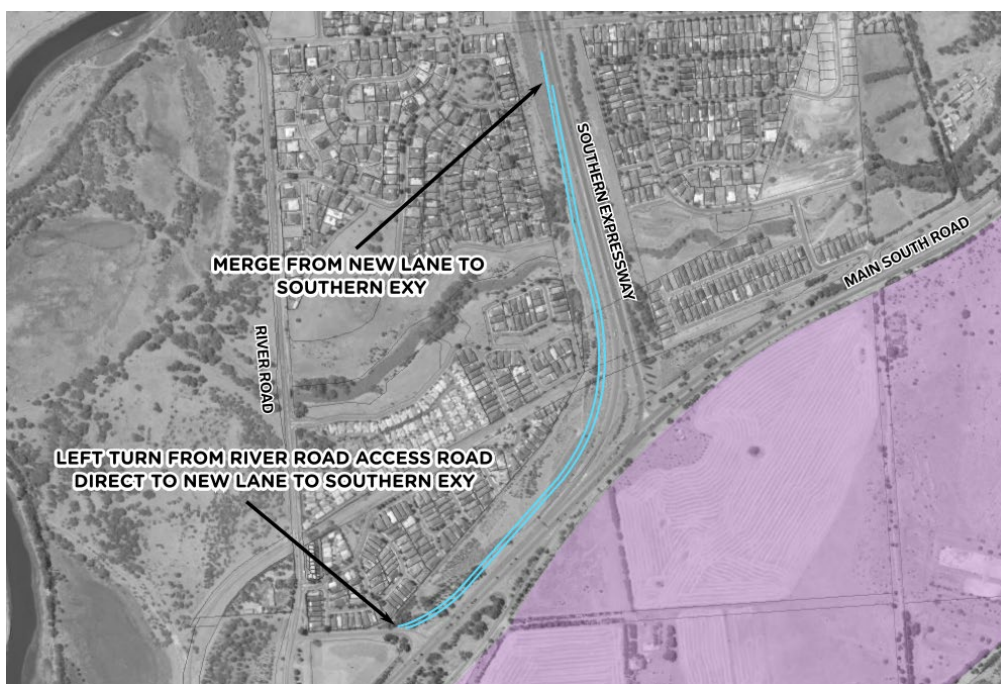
Potential direct connection between River Road Access Road and the Southern Expressway
